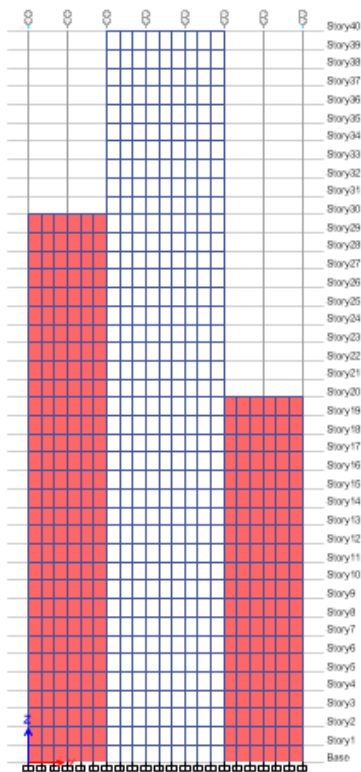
Elevation of bundled tube with shear wall i.e. model 4
